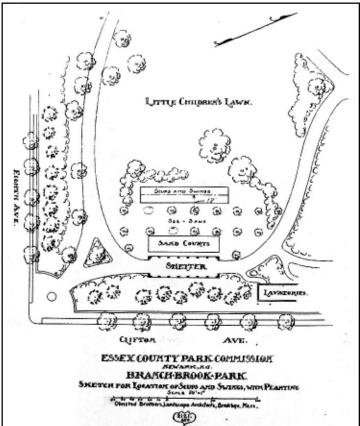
Plan for Playground Equipment with planting, Southern Division, Plan #21221-650, 27 June 1904. Note the parallel rows of gum trees. Source : ONHS.
